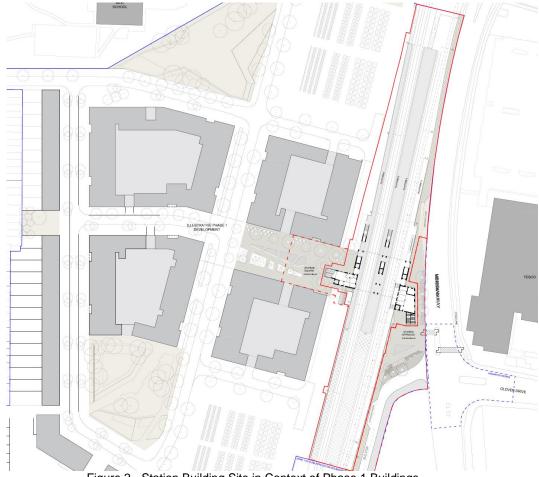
Station Building Site in Context of Phase 1 Buildings
